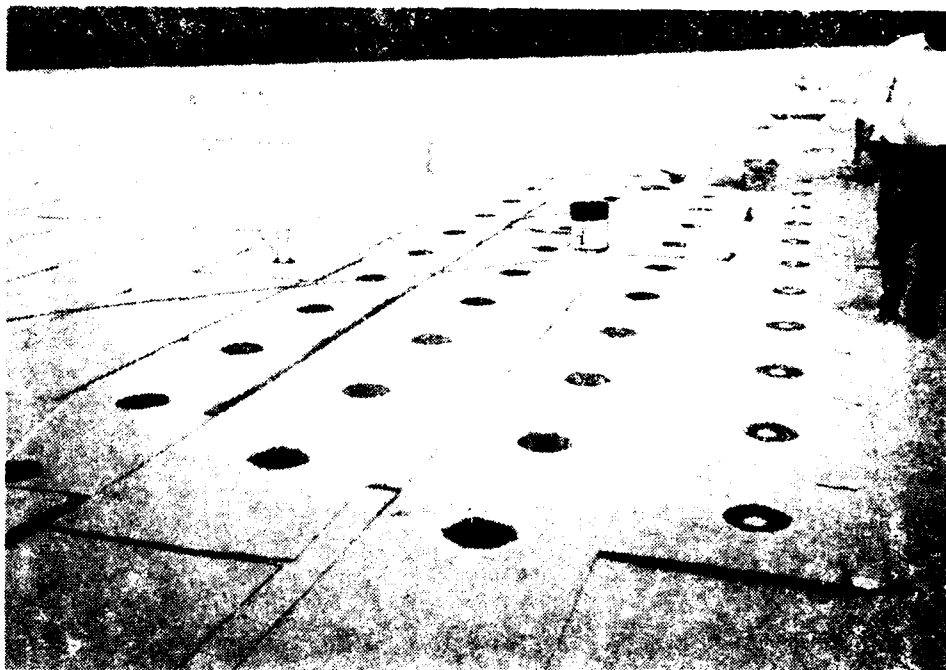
Staggered Anchoring Fasteners on Membrane B.
